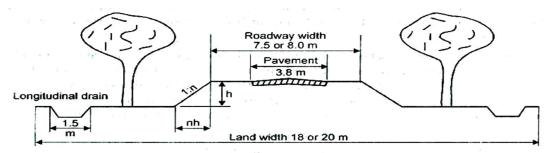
Cross-section of Village Road or Other District Road in embankment
